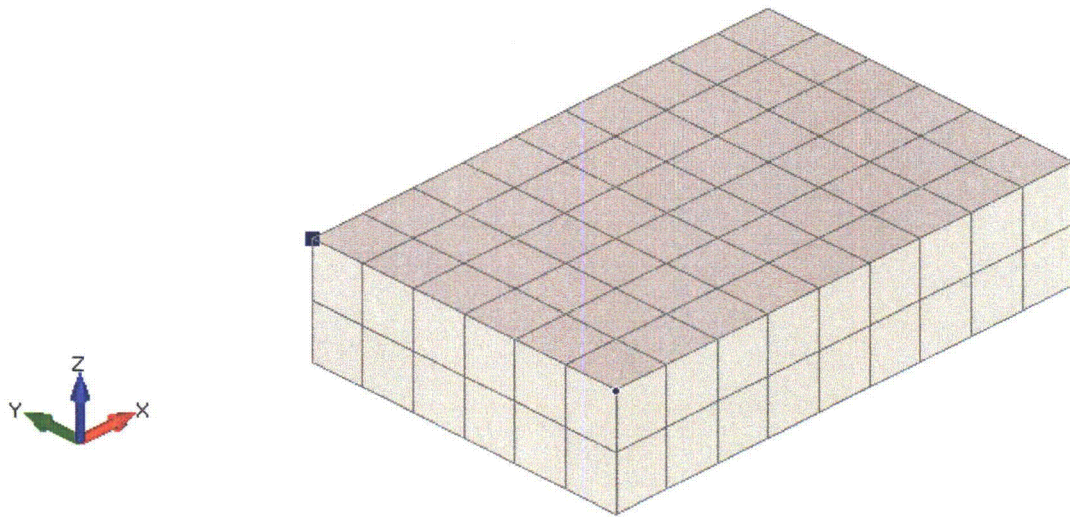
Isometric View of the Excavation Soil Elements
